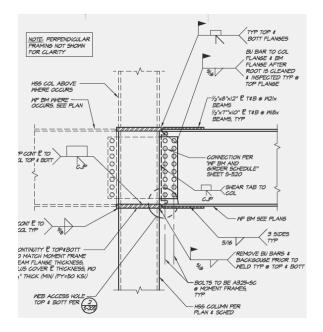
Tubular Column-wide Flange Beam Connection Detail
